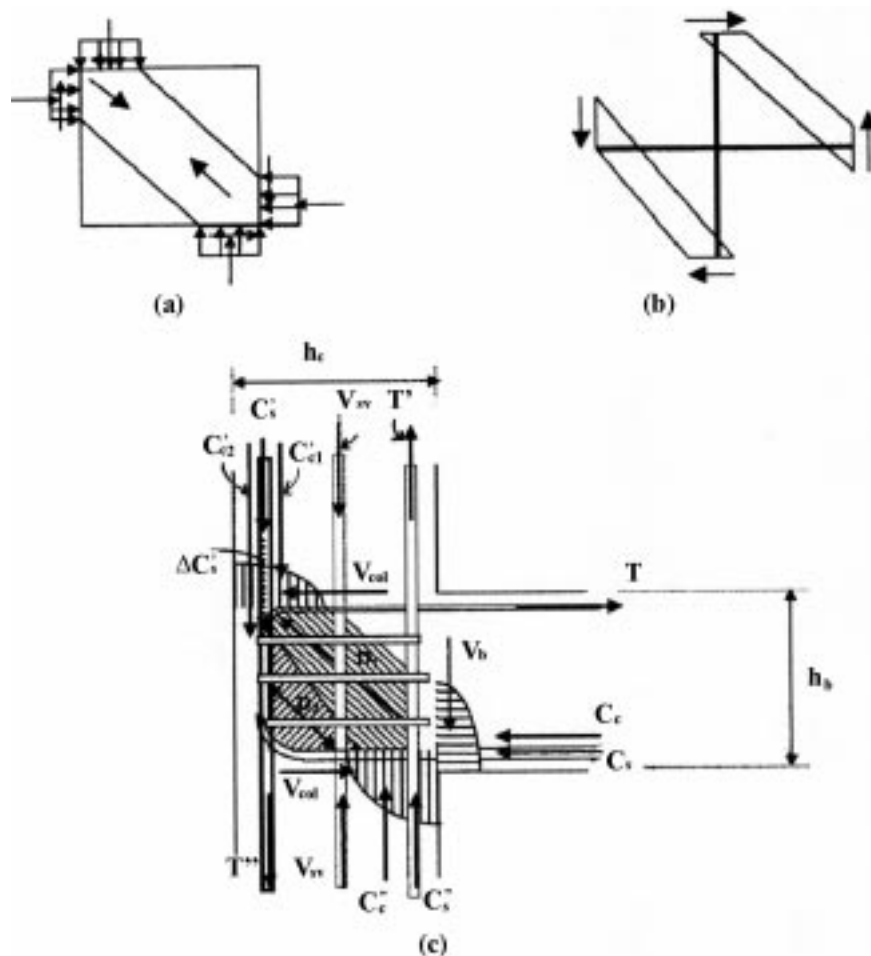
The diagonal strut mechanism; (a) and truss mechanism, (b) in interior beam-column joints, (c) idealised stress paths in exterior joints
